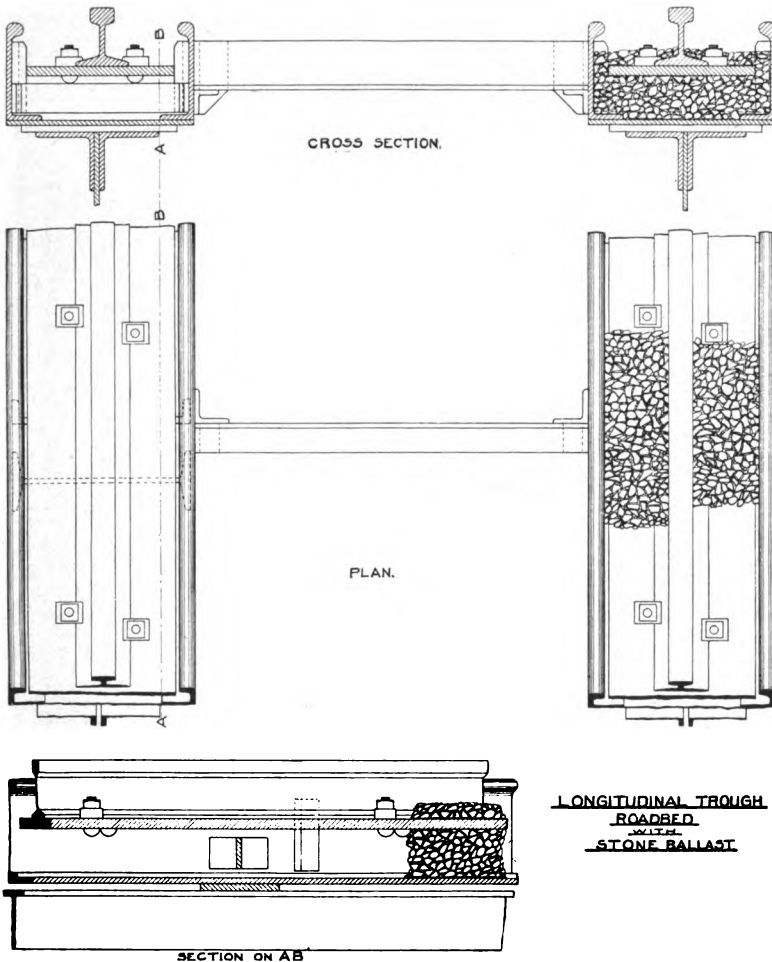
Suggested Type of Longitudinal Steel Trough Roadbed with Stone Ballast.
